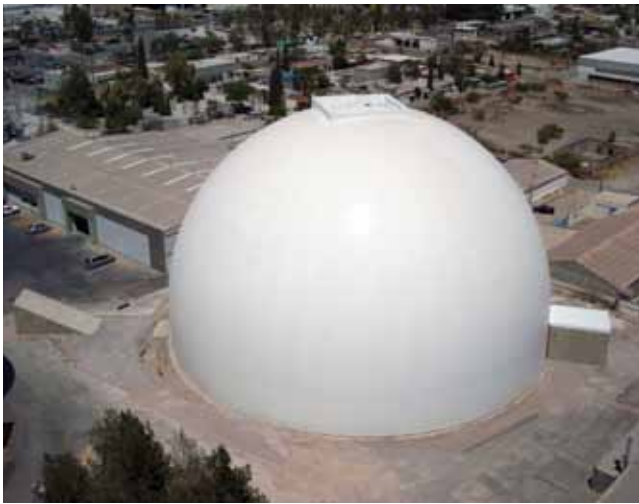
Shotcrete applied to waterproof membrane to construct a dome
